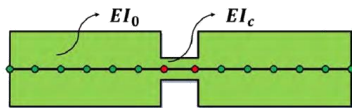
Reducing the cross-section of a reinforced concrete beam with a crack
